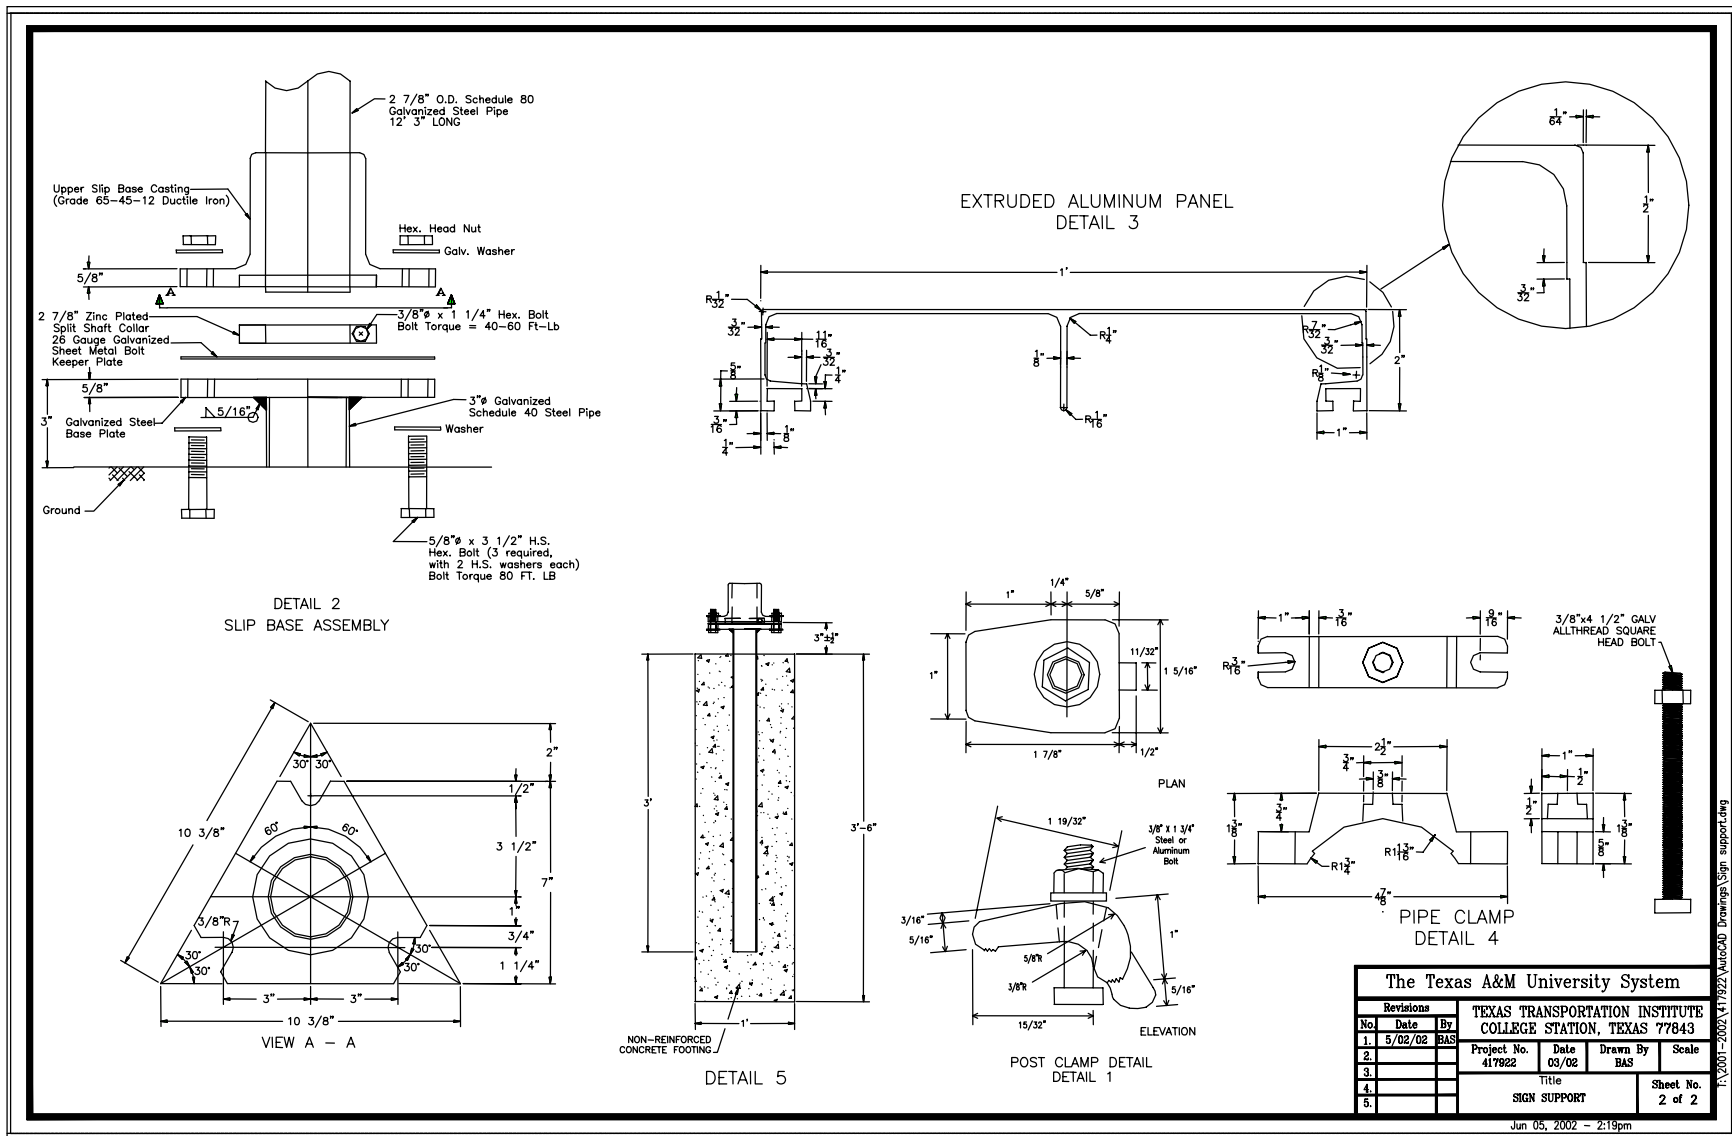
Details of the Sign Support Installation before Crash Testing (Continued).
